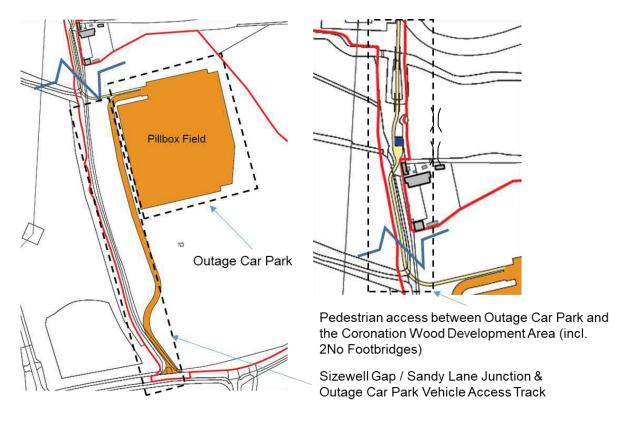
Pillbox Field Proposed Outage Car Park Plan
